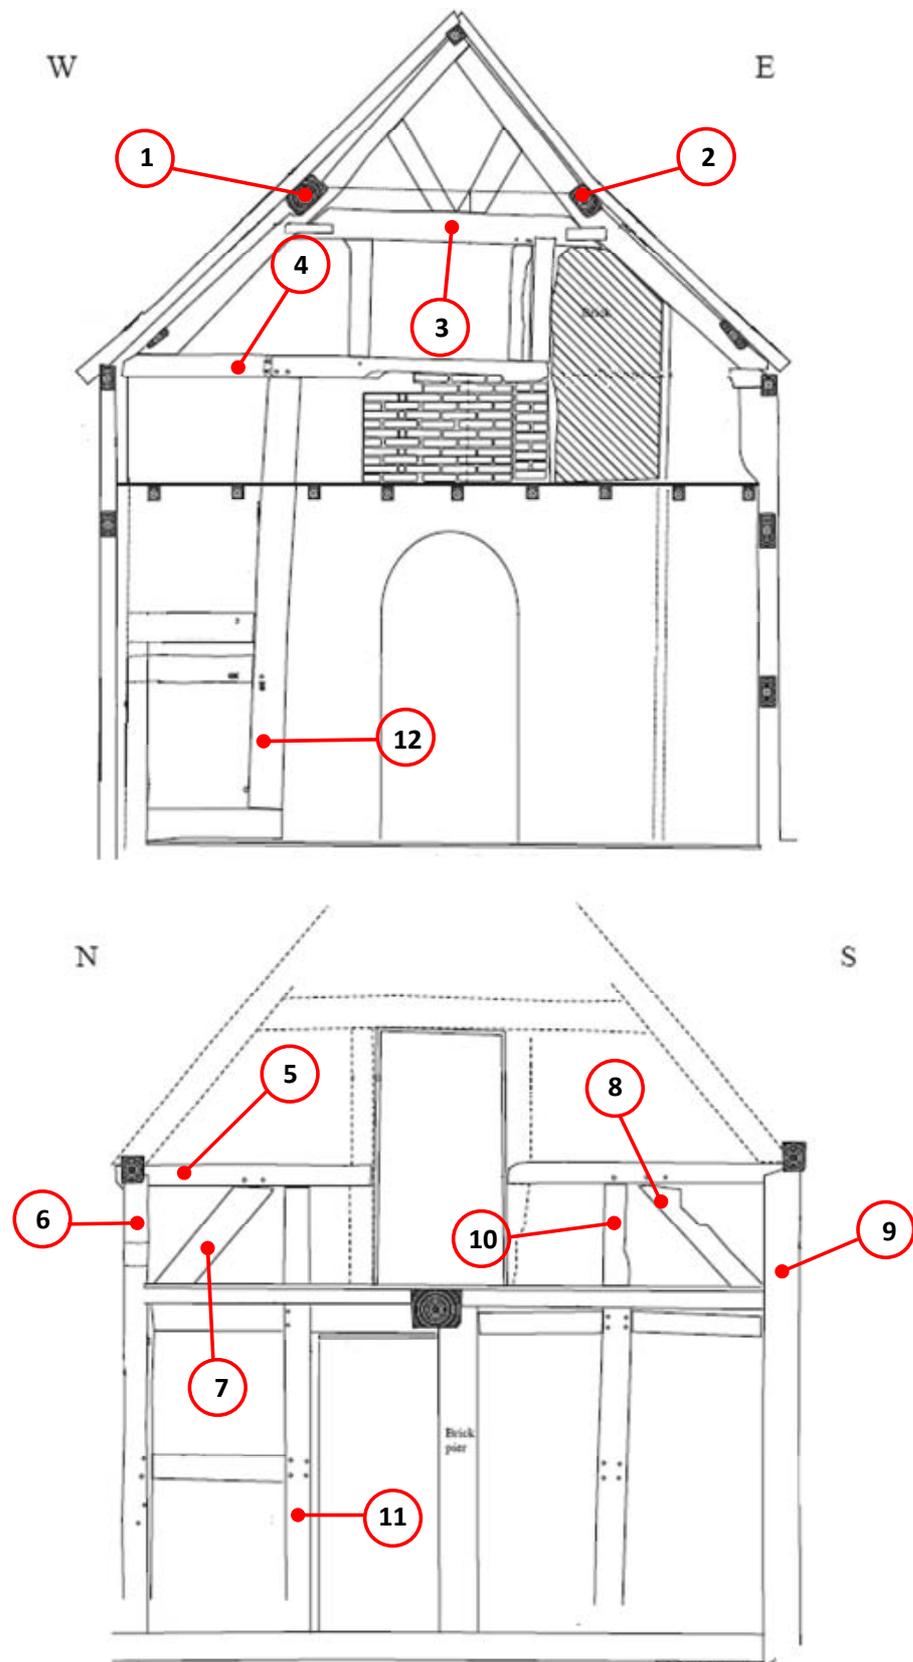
/b: Section through truss 1 (top) and the east wall (bottom) of building 1 to show sampled timbers (after Mike Napthan Archaeology)
